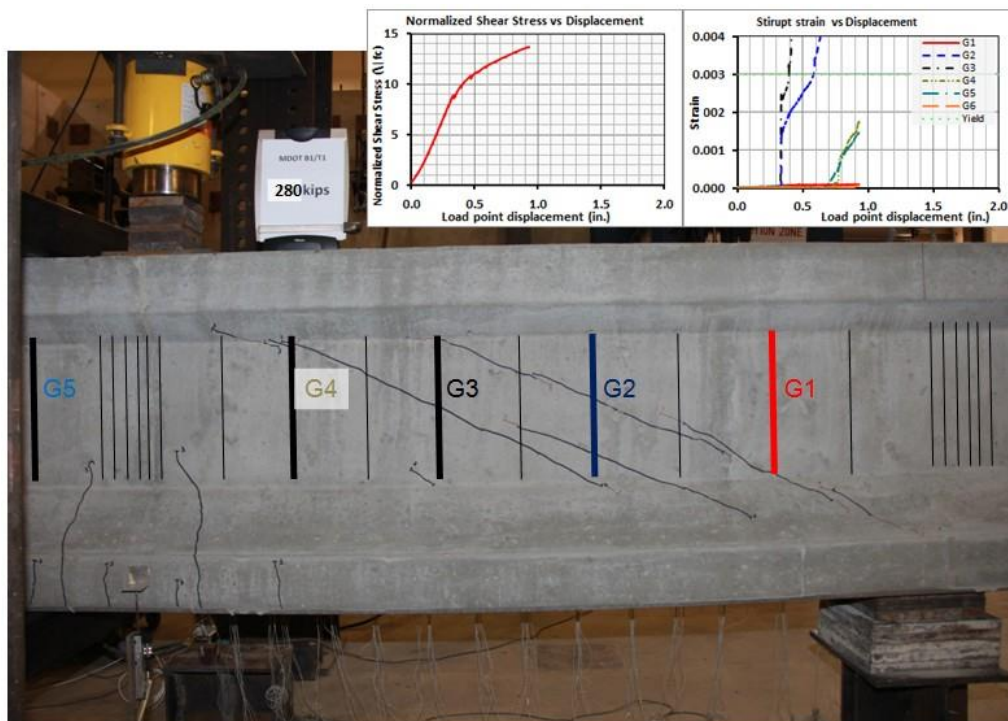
Girder 1-Test 1 flexural cracks
